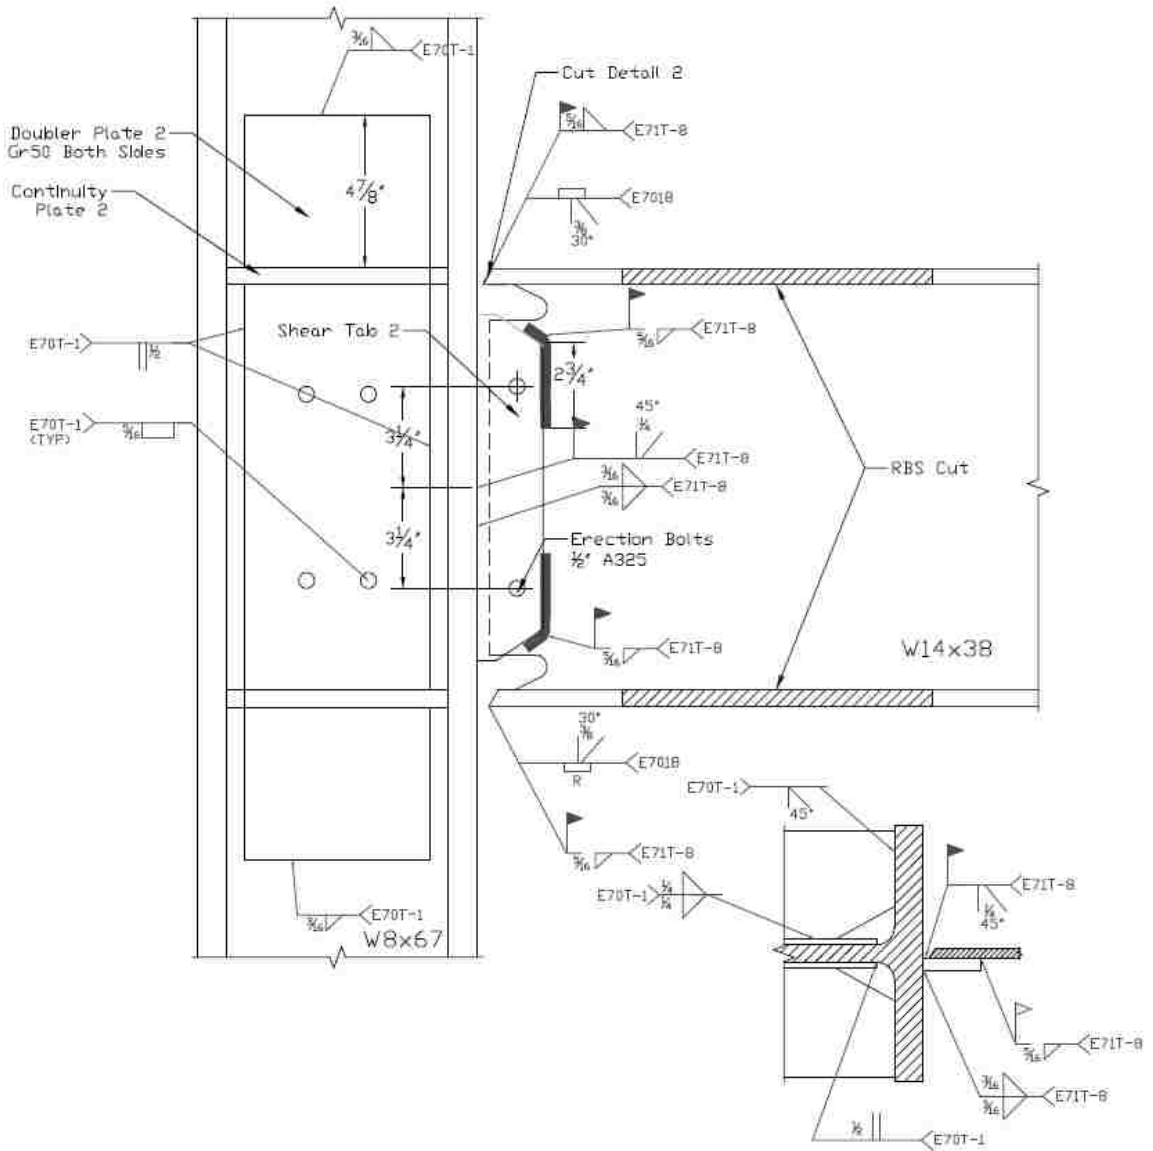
MRF 2nd Floor Beam-to-Column Connection Details
